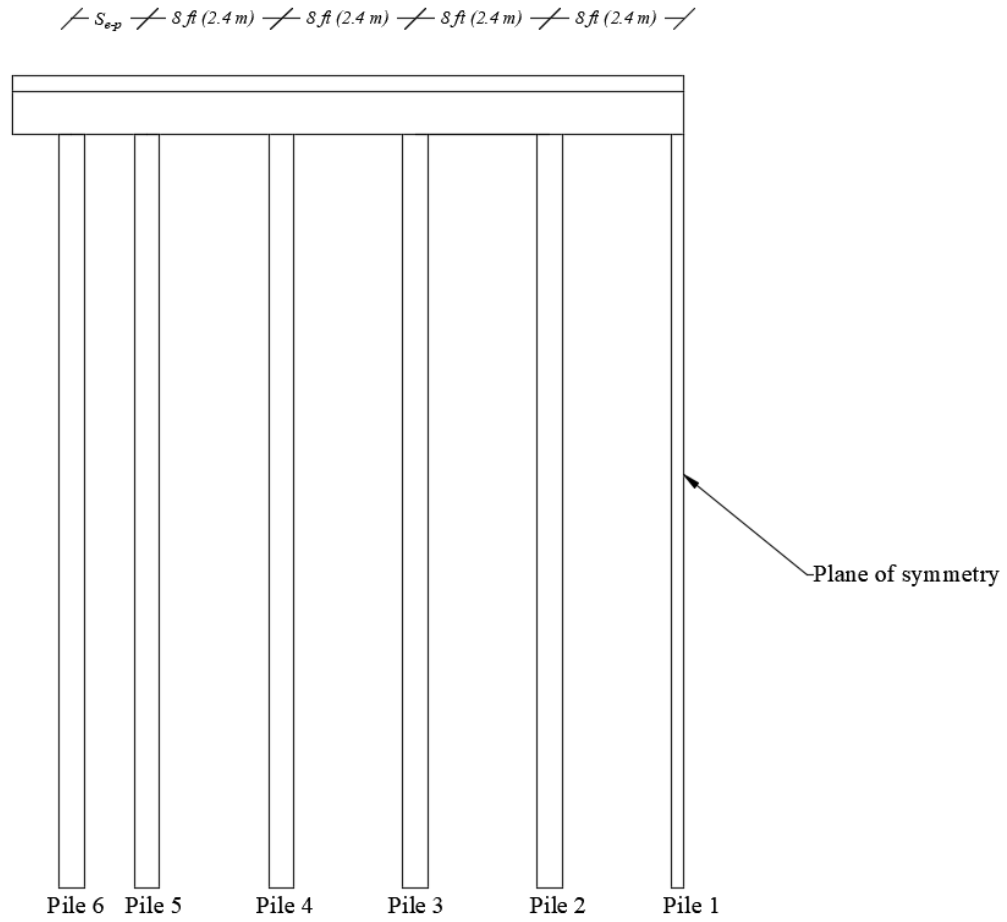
Transverse cross section of the proposed two-segment pile-supported approach slabs
